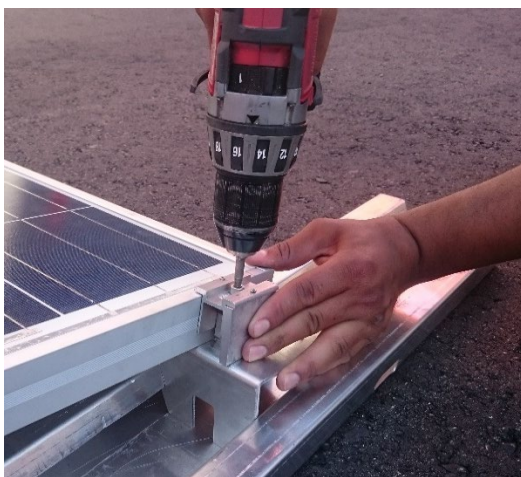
Fasten KB Konnect End Clamp, with End Block
